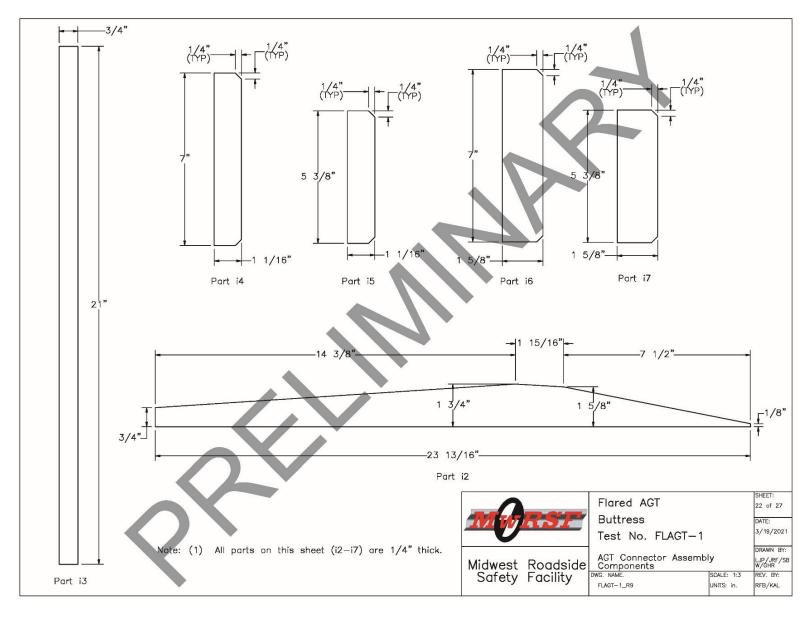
AGT Connector Assembly Components, Test No. FLAGT-1
